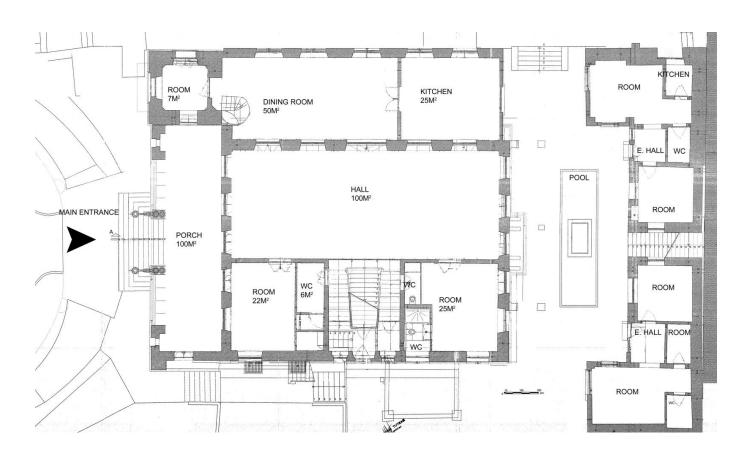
27 Mizzi Mansion, Ground Floor Plan.
